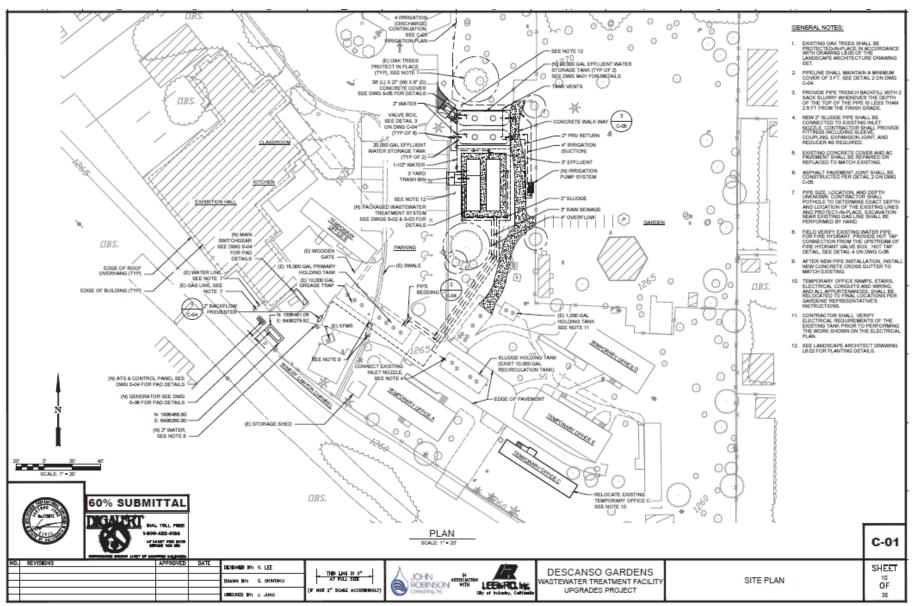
Site Plan – Descanso Gardens Wastewater Treatment Plant
